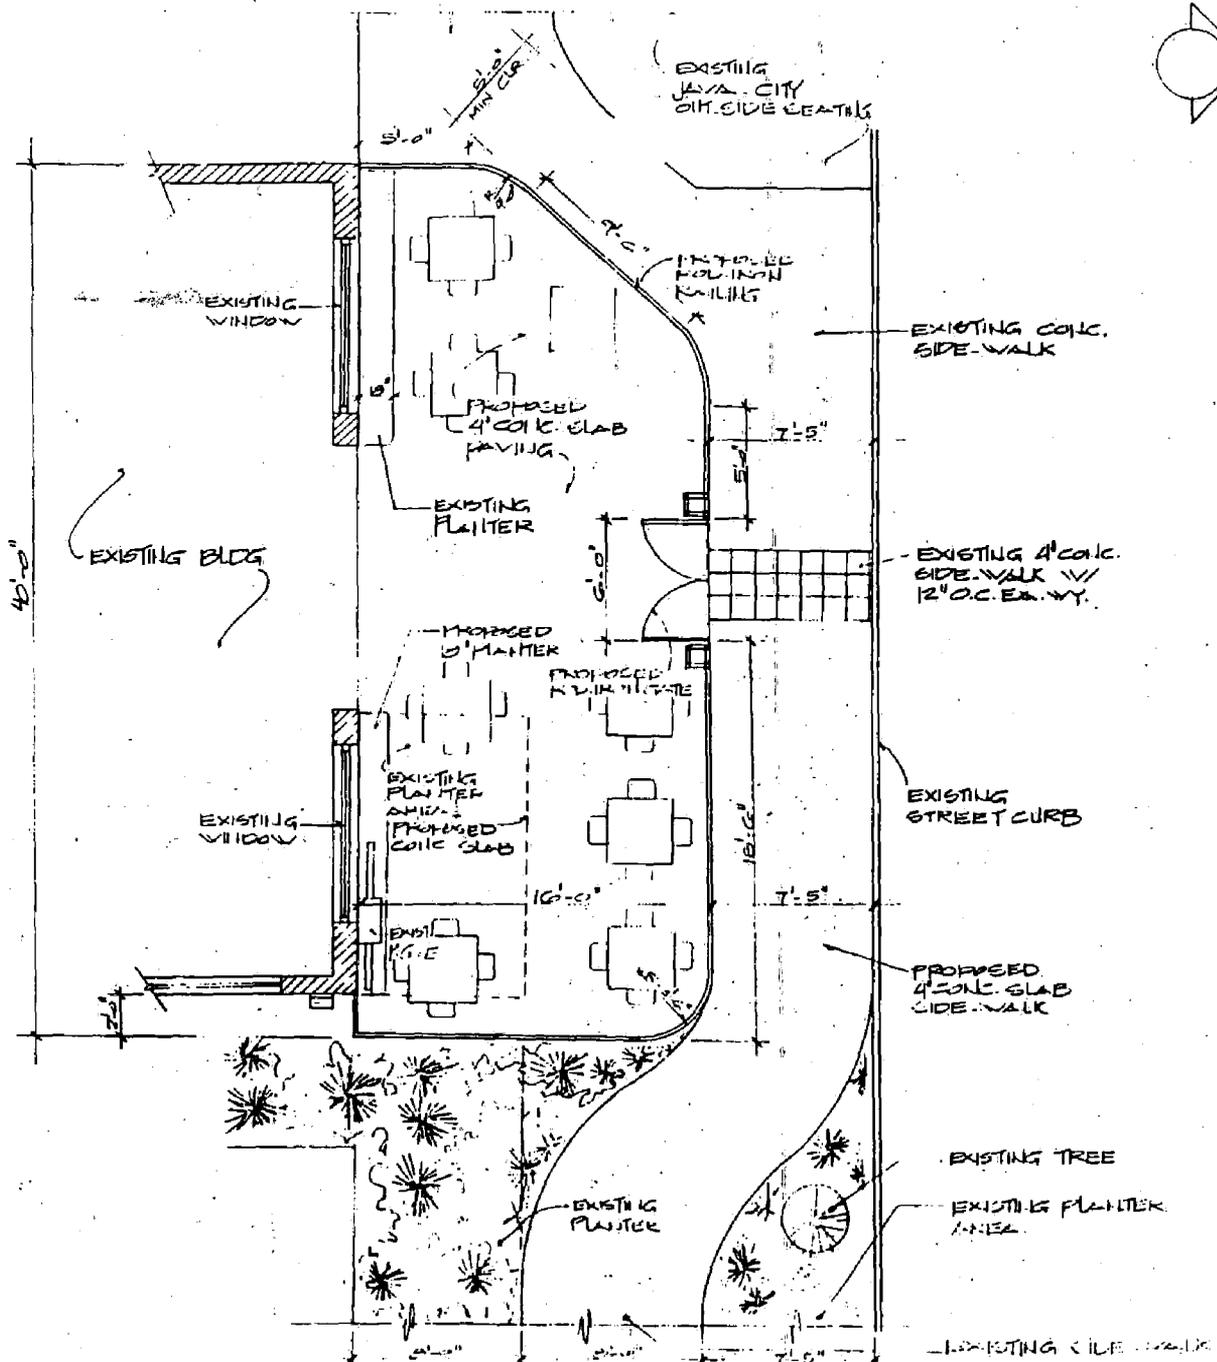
Site Plan - Sidewalk Cafe "Alternative" Design
